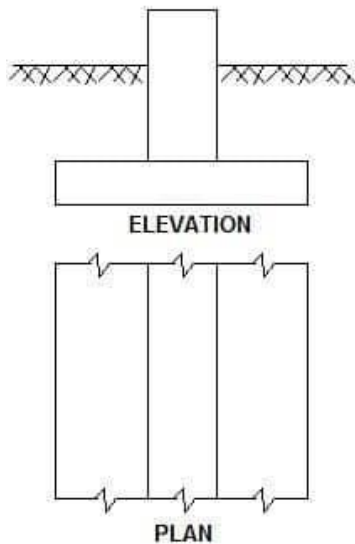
Strip Footing (Mishra, 2016) Figure 4.3. Shallow Strip Foundation (Das, 2011)
